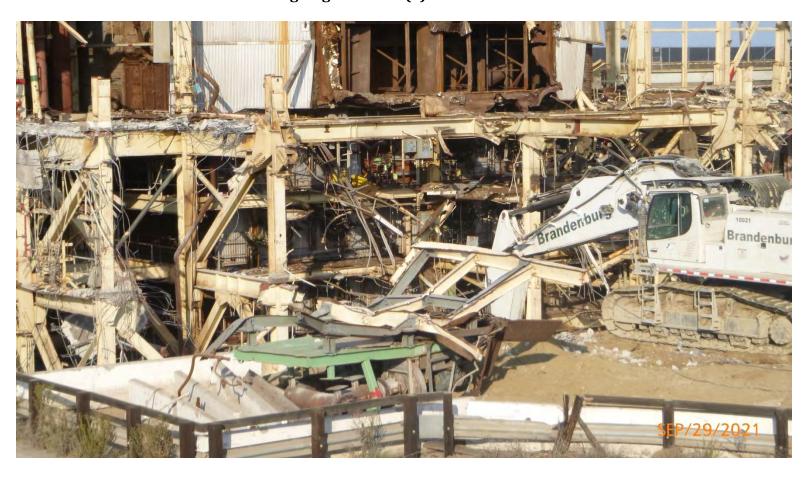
Unit #5 Structural demo ongoing east face. (b)
